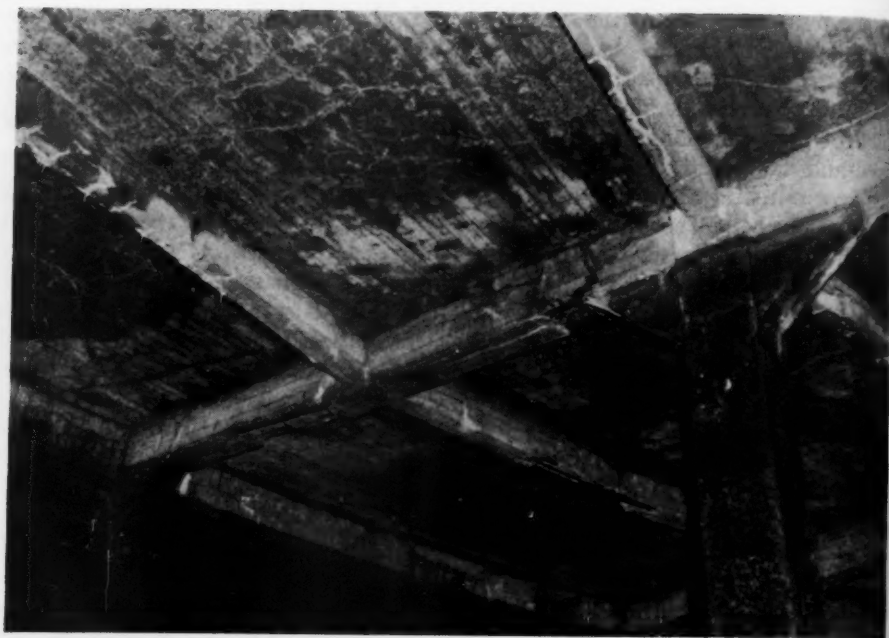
Fractured Beam and Girders in Underside of Roof Slab
